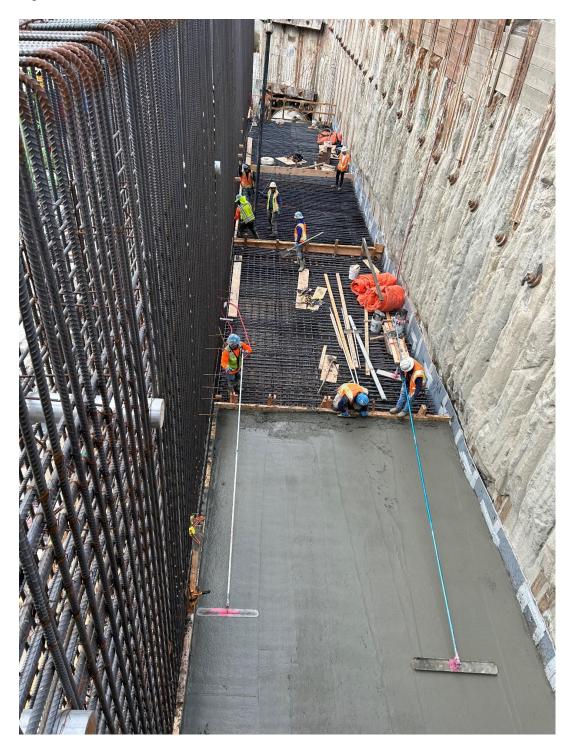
Finishers placing concrete for the UV Influent Weir Structure roof deck. The rebar for the exterior wall of the UV Room is on the left side of the photo and the excavation support system is shown on the right side of the photo.
